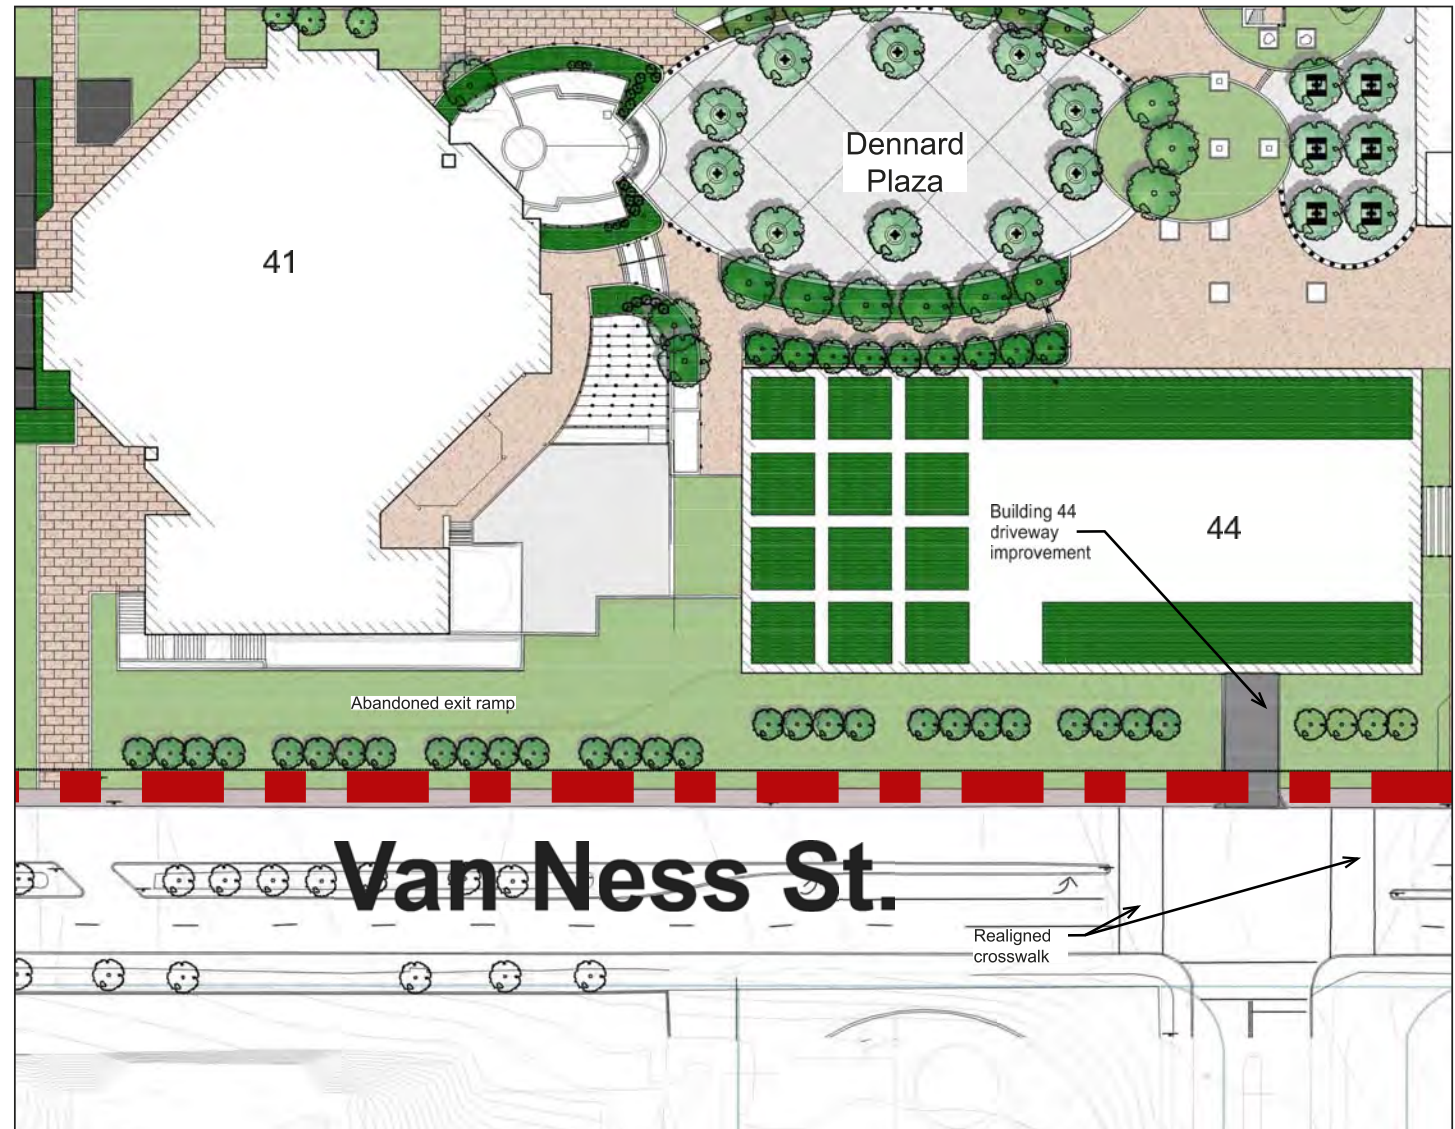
C PROPOSED CAMPUS ENTRY - VAN NESS
